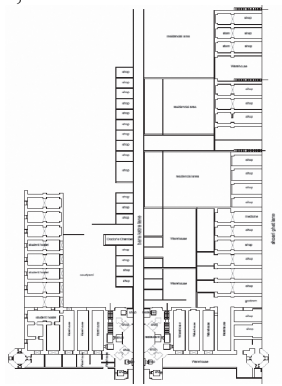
Existing ground floor plan of Bara Katra. (Source: Department of Archaeology, Bangladesh).
